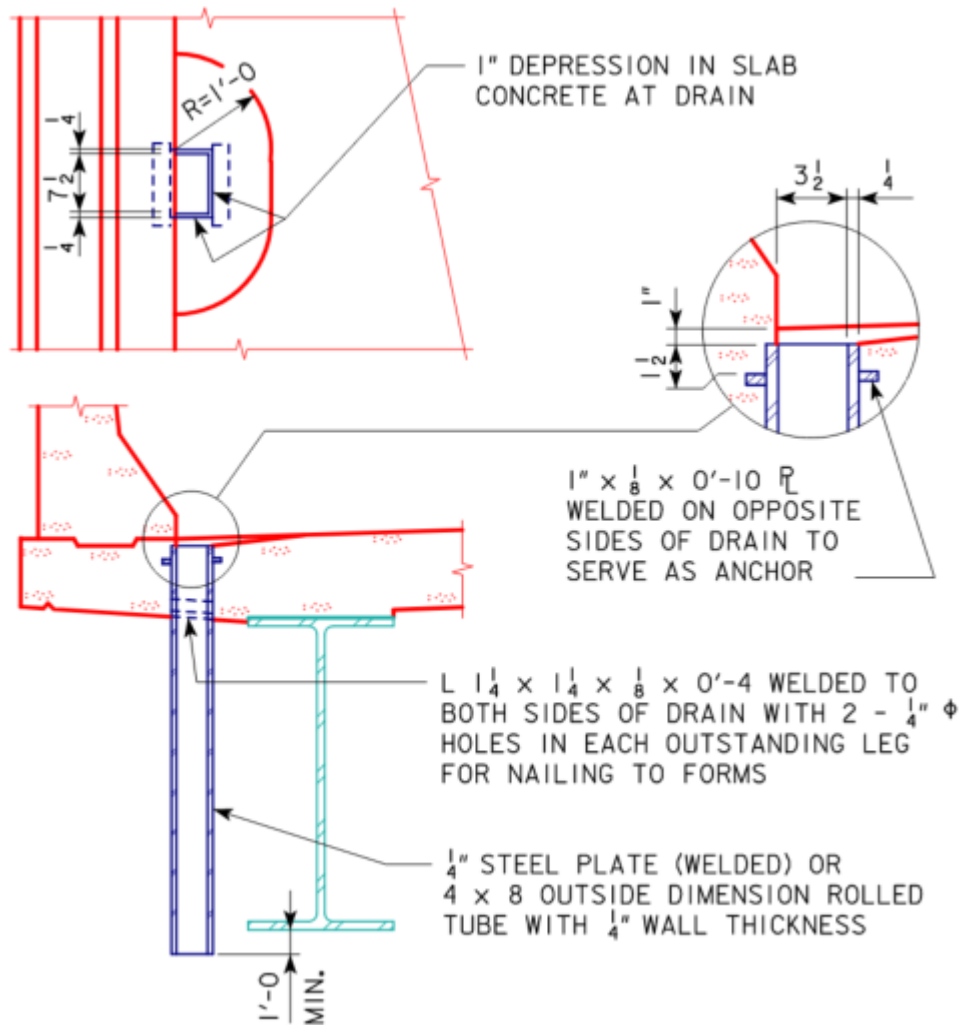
Deck drain design per standard plans by Iowa DOT for rolled steel beam bridges (Iowa DOT, 2018).
